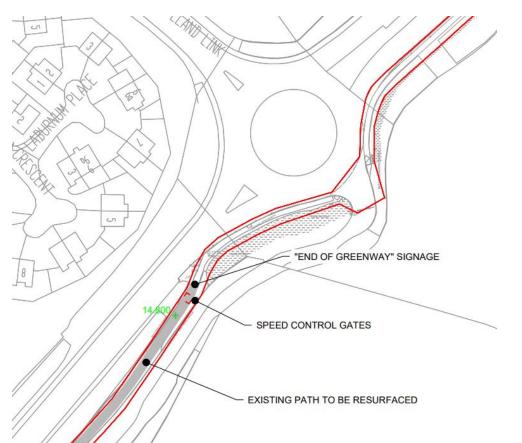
Amended plan showing no works to take place within agreed section of the route. Drawing 36C
